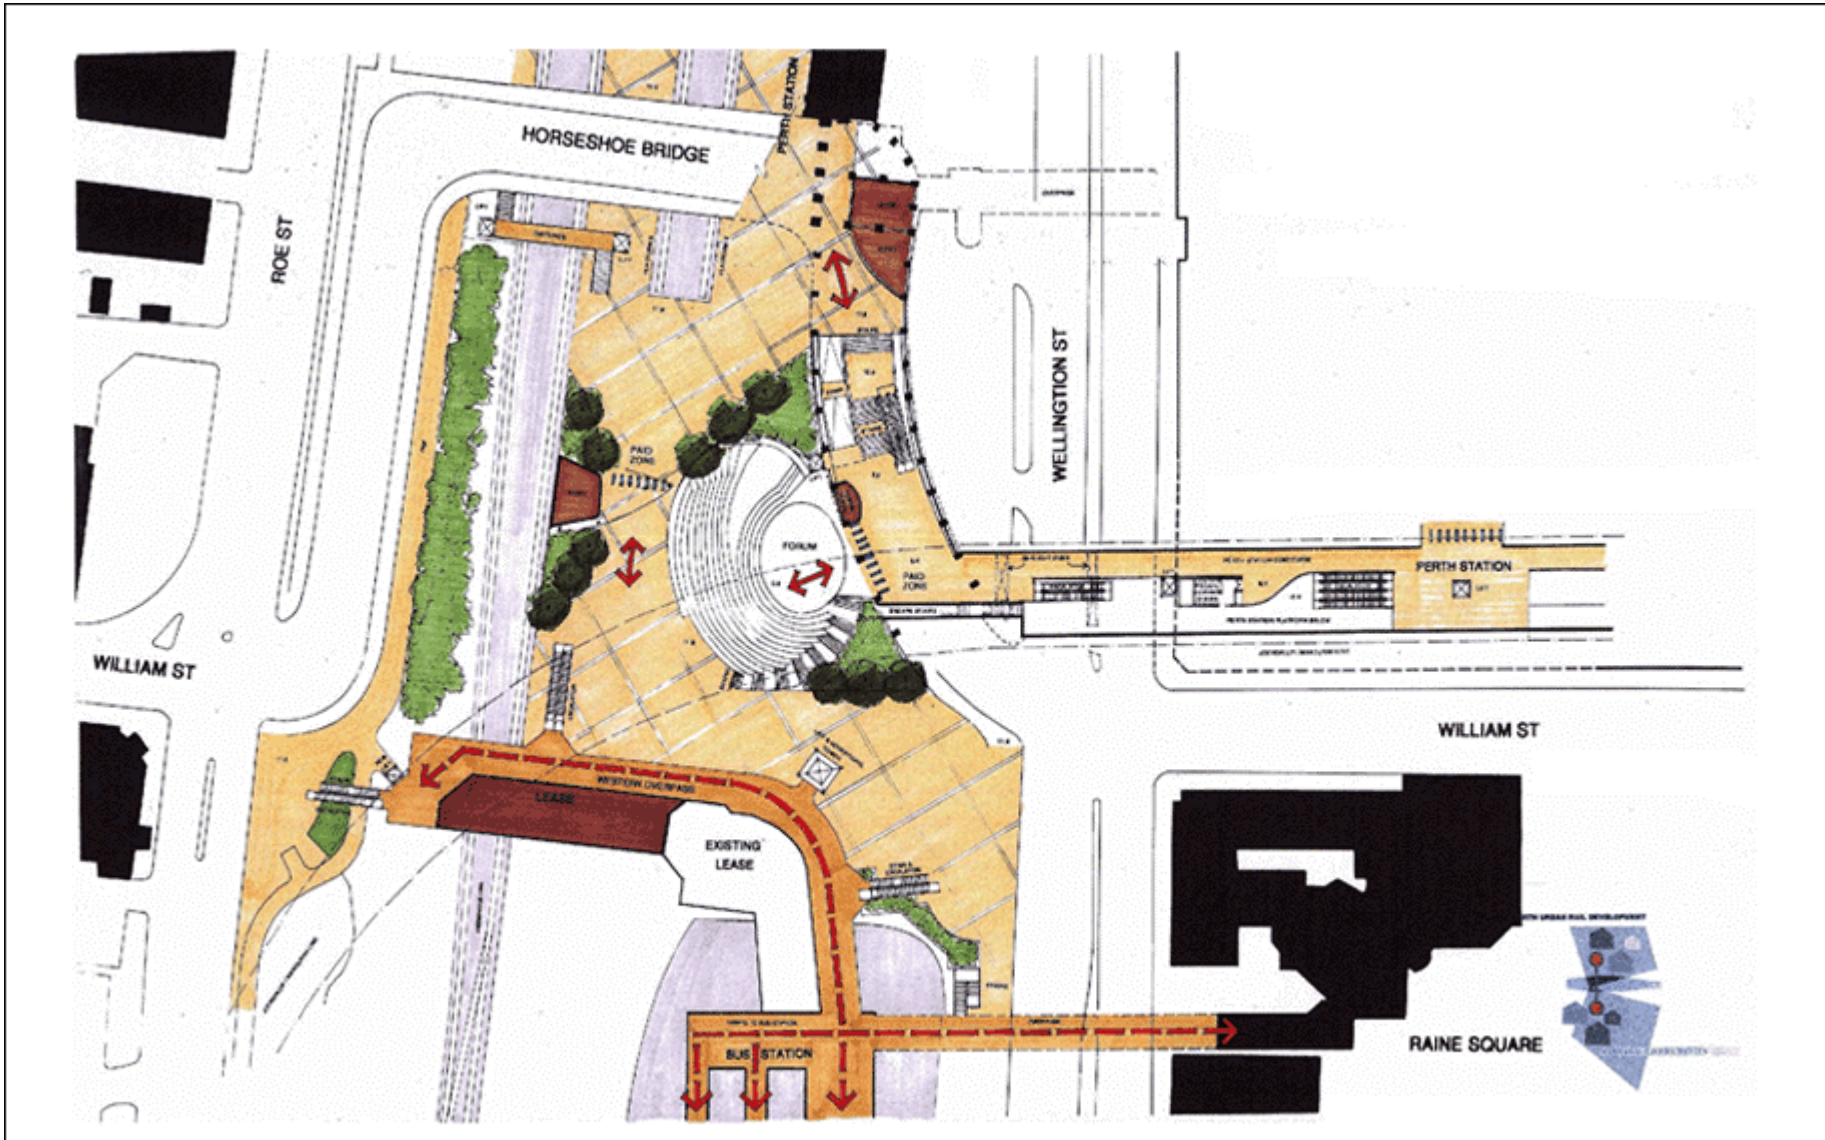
Plan of New Perth City Station Platforms & Horseshoe Plaza
